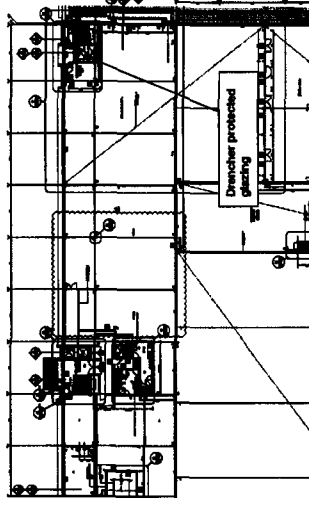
Proposed Drencher-protected glazing on Level 2
